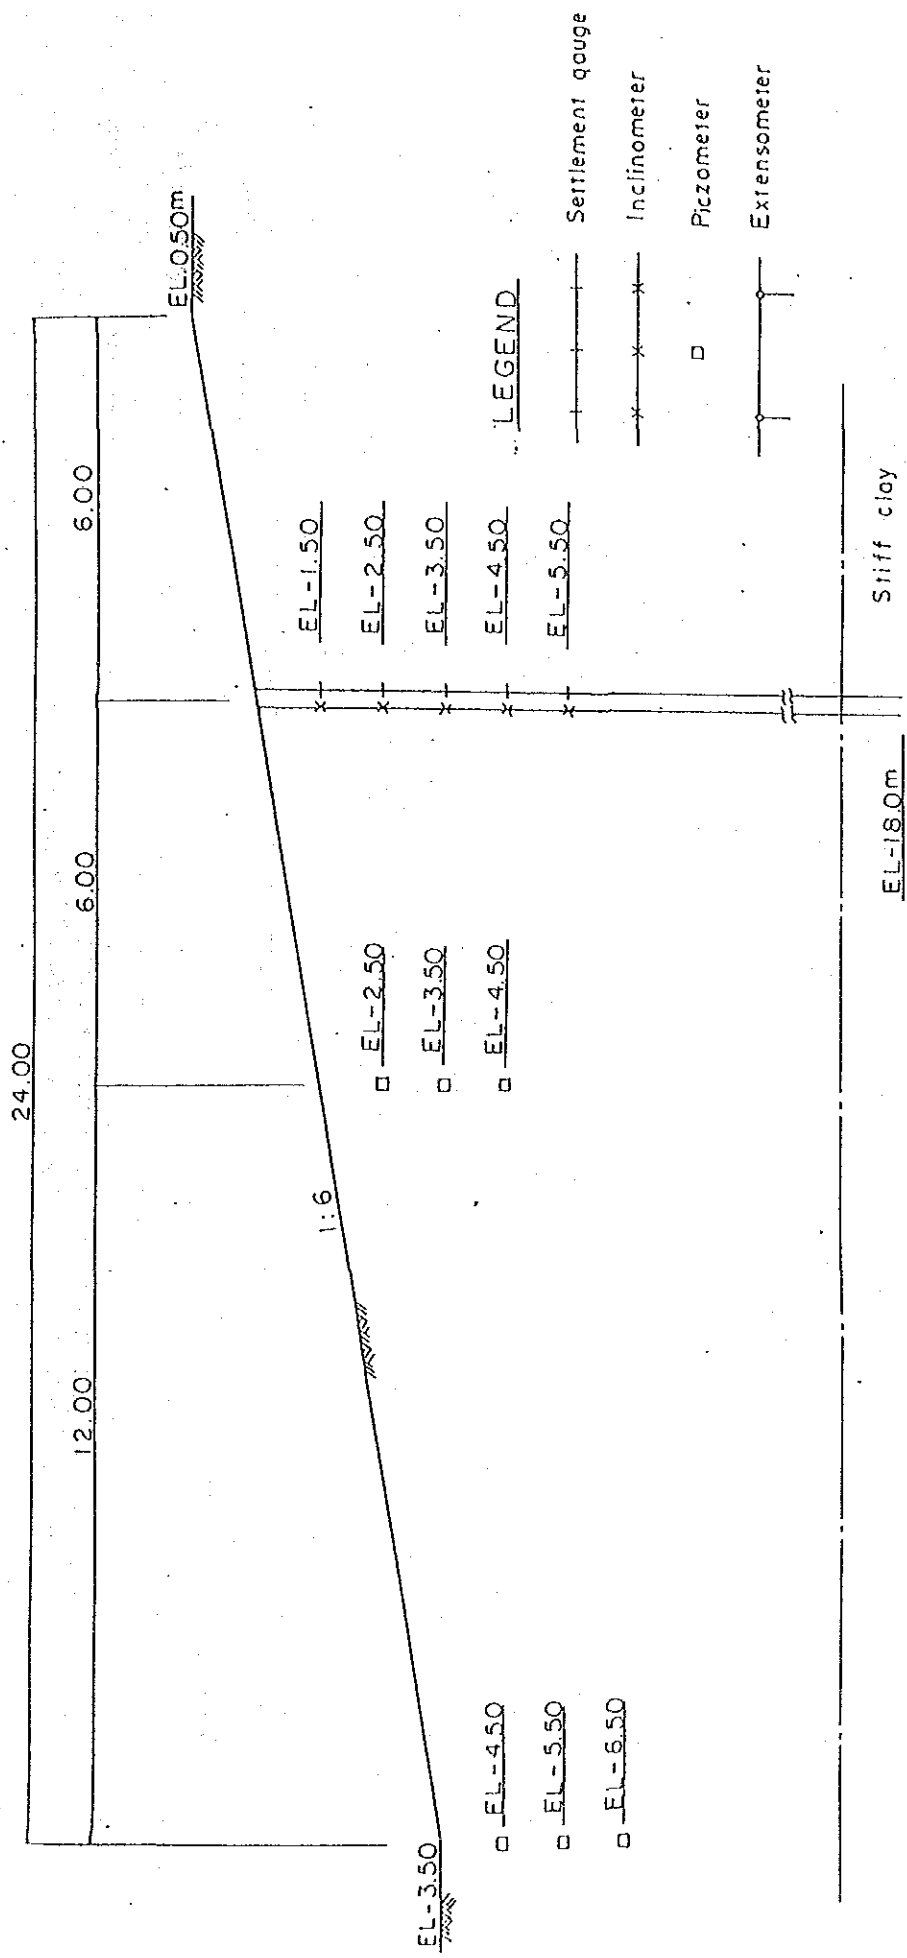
Installation Plan of Monitoring Instrument on Non-treatment Slope (1:6)
